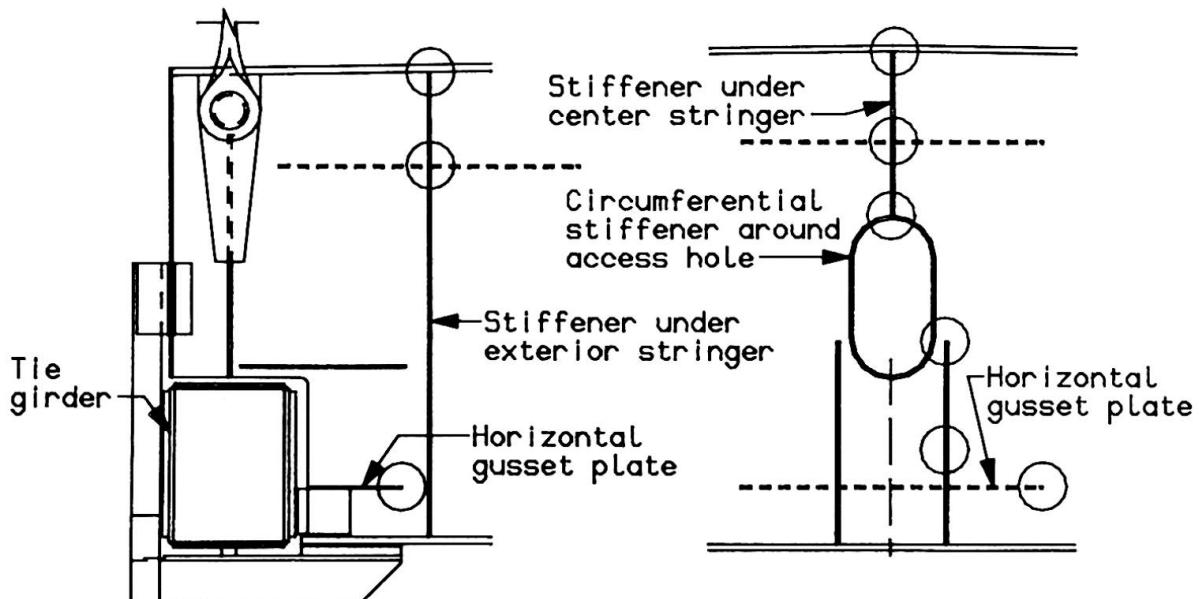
Locations of typical fatigue cracks on welded floorbeams.
